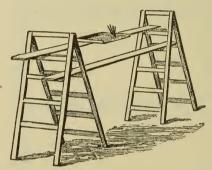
Painting Bridge of Boards supported on Trestles.
